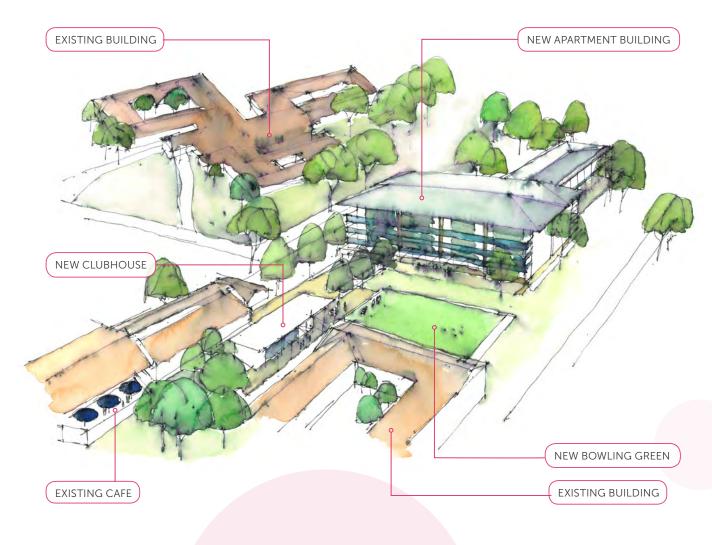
Impression Of Stage 1 Redeveloped Recreation Hub, Including Bowling Green, Clubhouse and New ILUs.
